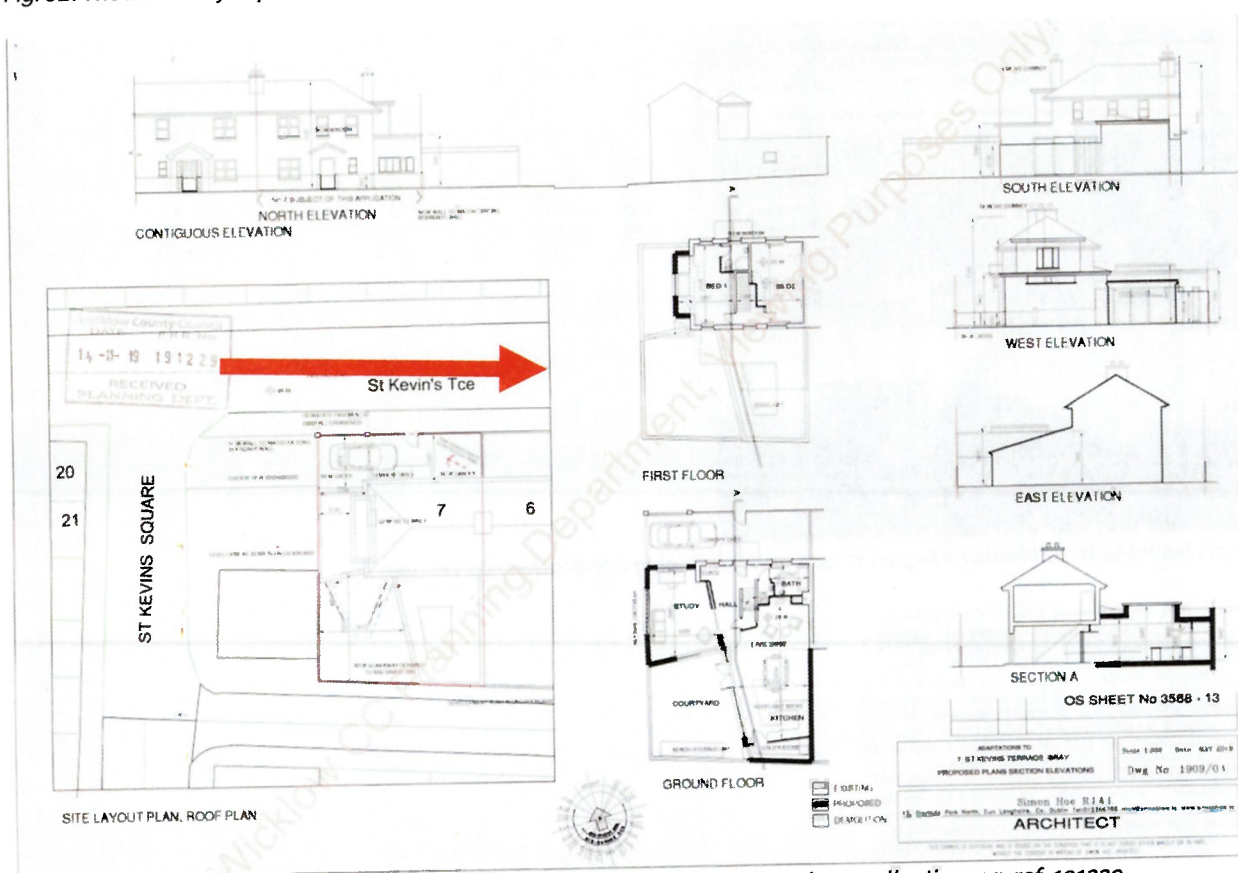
Adjoining property's permitted planning drawings issued under planning application reg. ref. 191229
